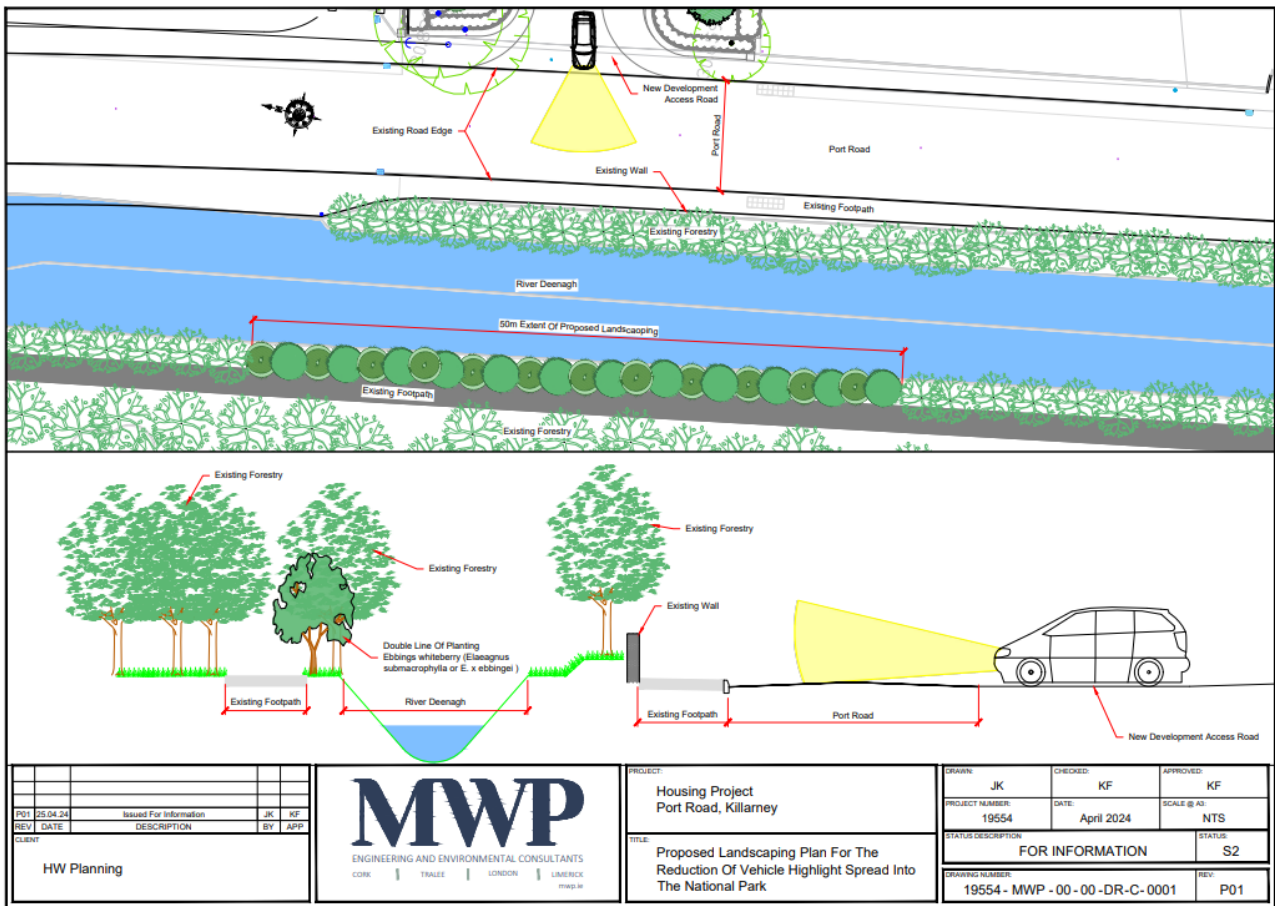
Proposed landscaping to reduce vehicle glare from the proposed development site into Killarney National Park (Source: MWP).
